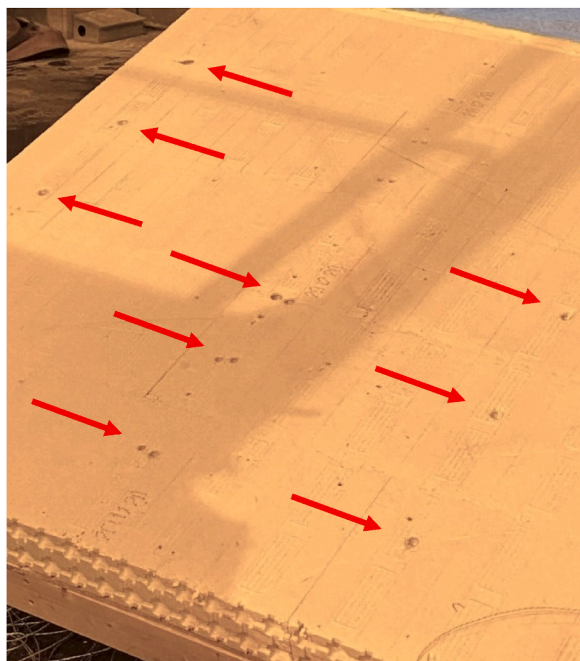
Damage to the EPS insulation following Test 5 (a single layer of OSB board and a single layer of gypsum board, test duration: 15 min).
